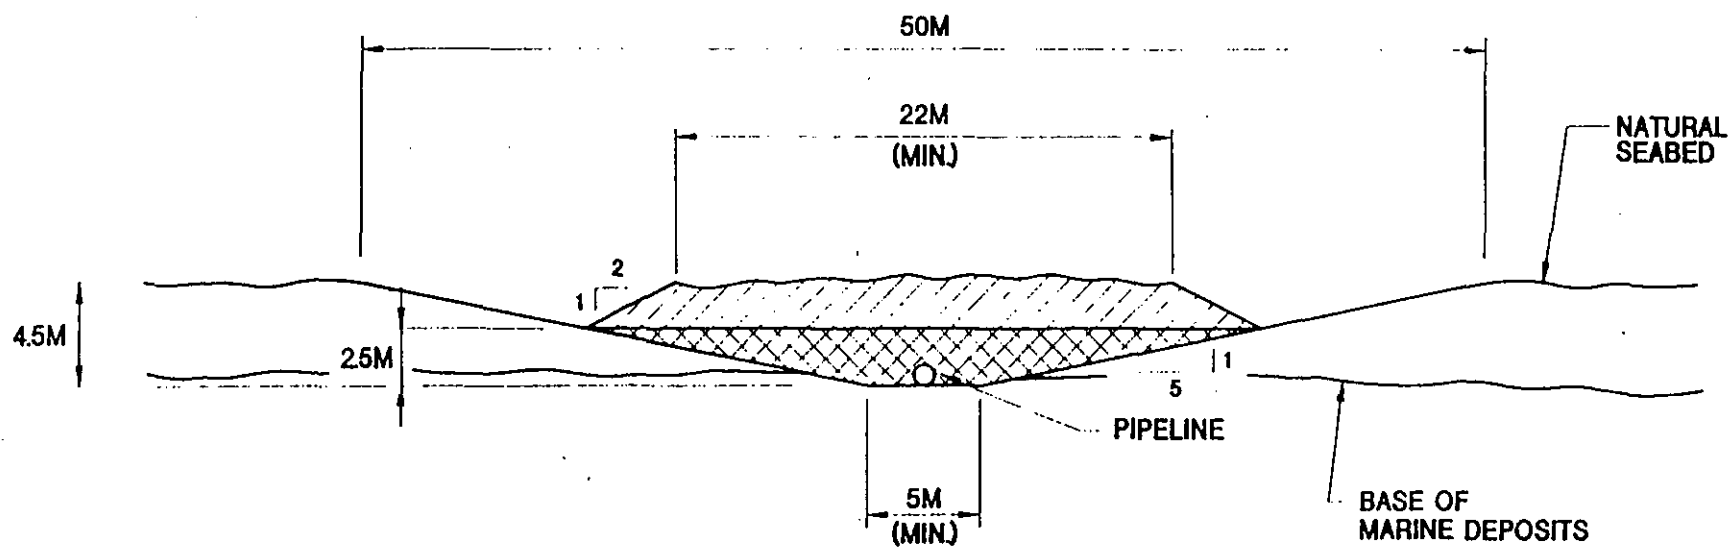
Urmston Road Channel Typical Pullbarge Obstruction Envelope Alternative 2
